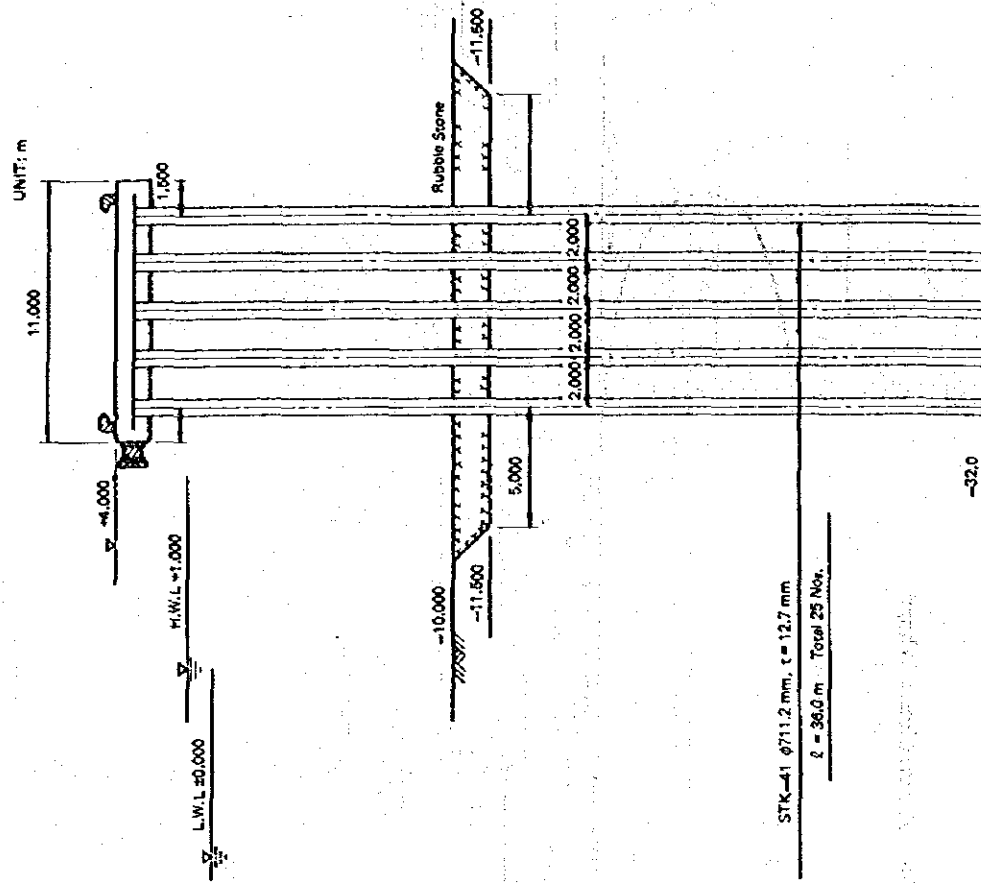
(d) Typical Section of Mooring Dolphin
